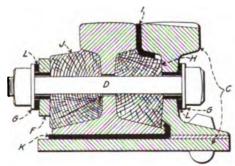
Insulated Rail Joint. Railroad Supply
